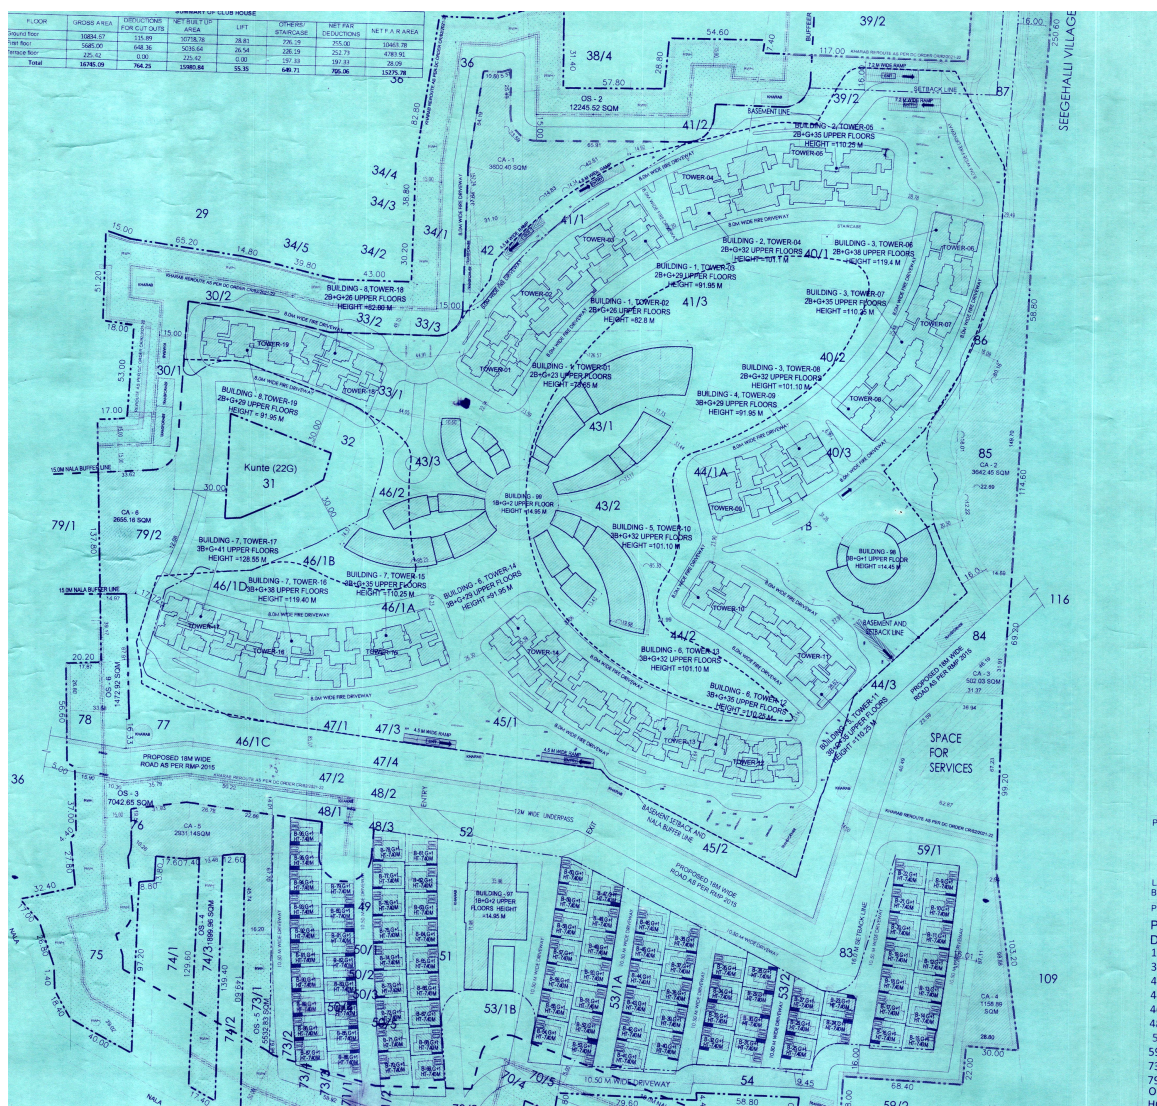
Source crop: BDA sanctioned layout, sheet 1. North is up. Apartment towers occupy the upper district; villa rows are below the proposed 18 m road. The detailed villa drawing appears in Chapter 8.
